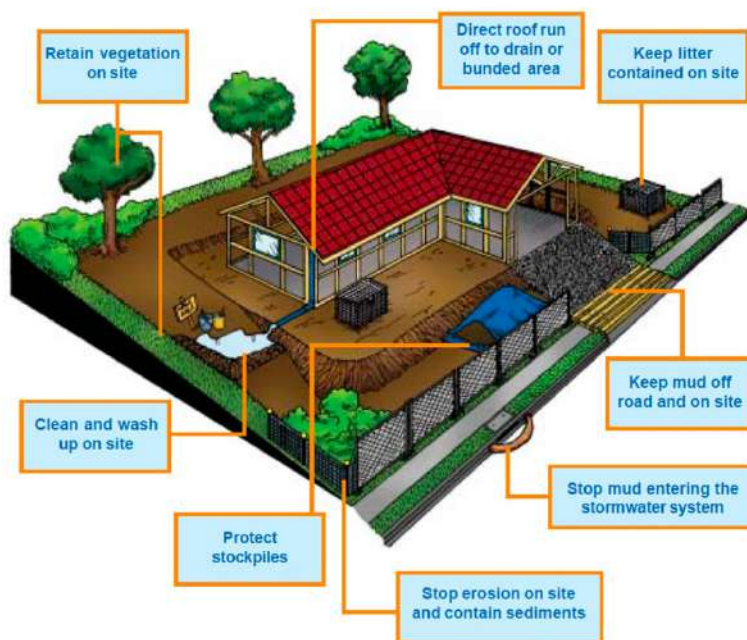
A diagram summary of the stormwater management techniques used on the construction site
